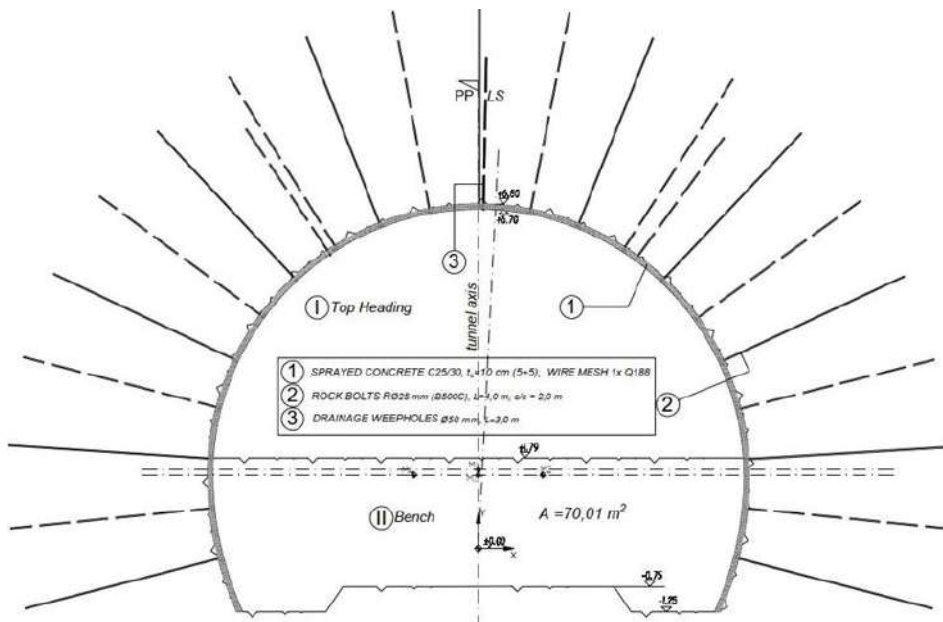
Typical cross-section of the initial lining (rock support system) for a two-layer tunnel lining (Source: Spasojevic, 2022, 2025).
